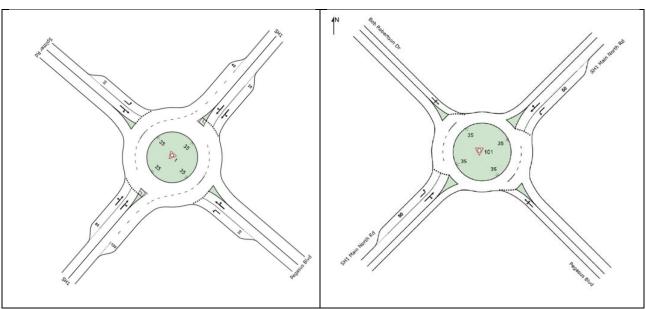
SH1 Roundabout Modelled (Existing Layout on Left, Possible NZTA Concept Layout on Right)
